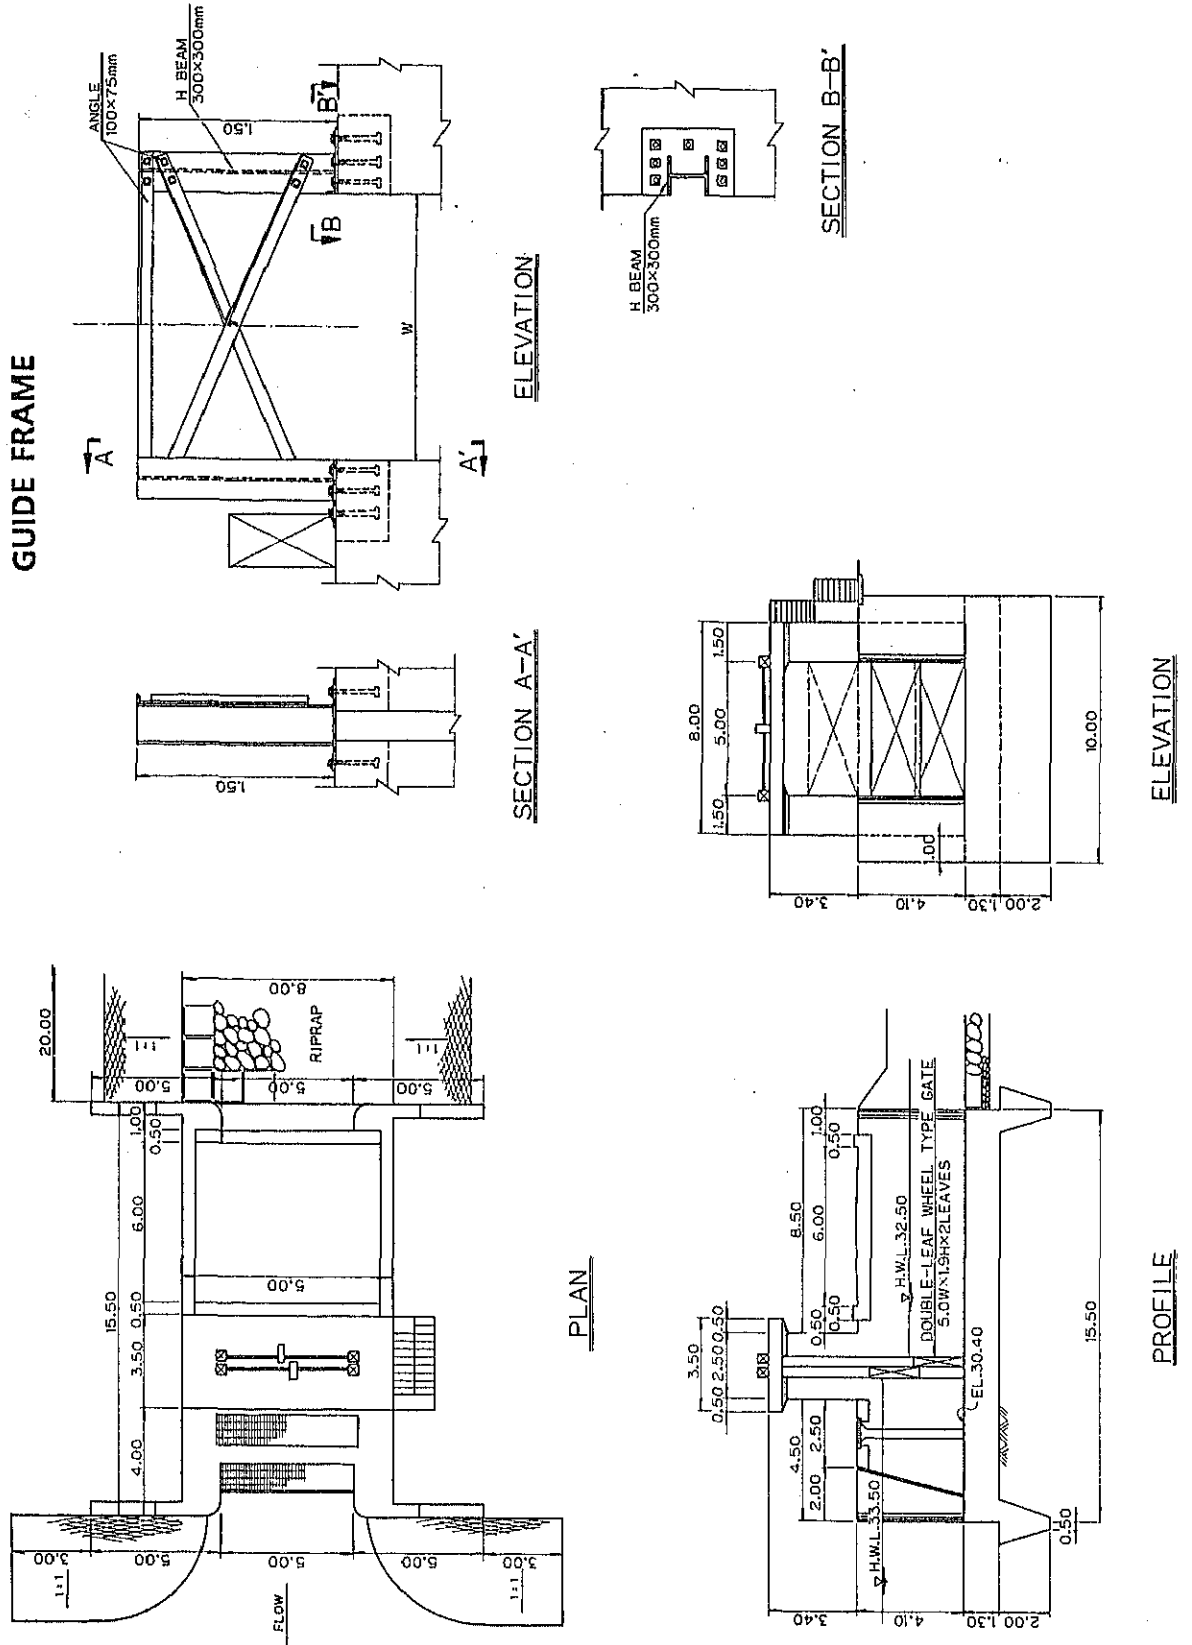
Proposed Plan of Large Scale Intake (El Giza Intake)
